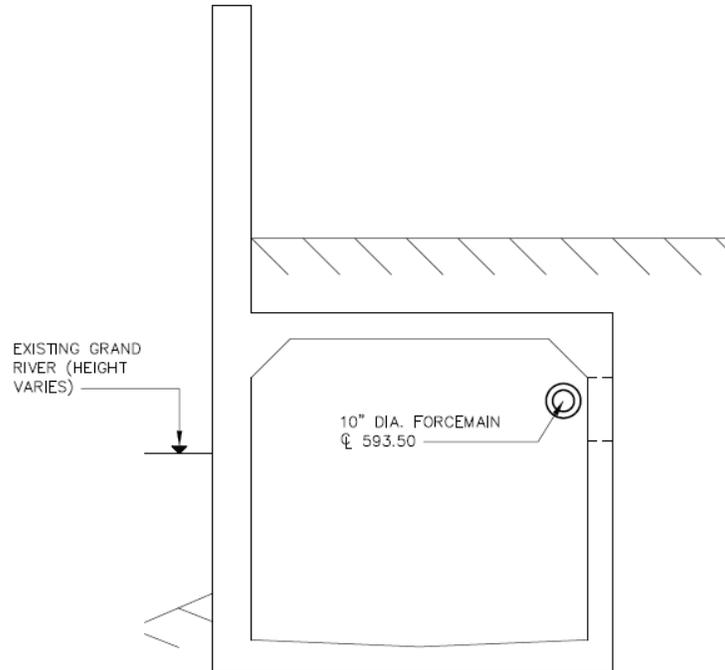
Design of 10-inch force main mounted on the wall of the trunk sewer. (Plans 2017)
